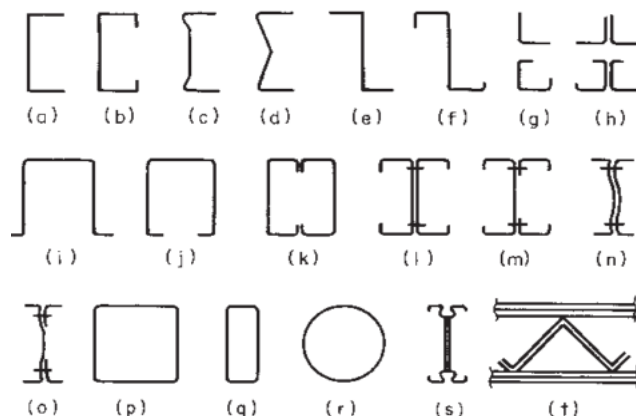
Various CFS Sections (Yu and LaBoube, 2010)
